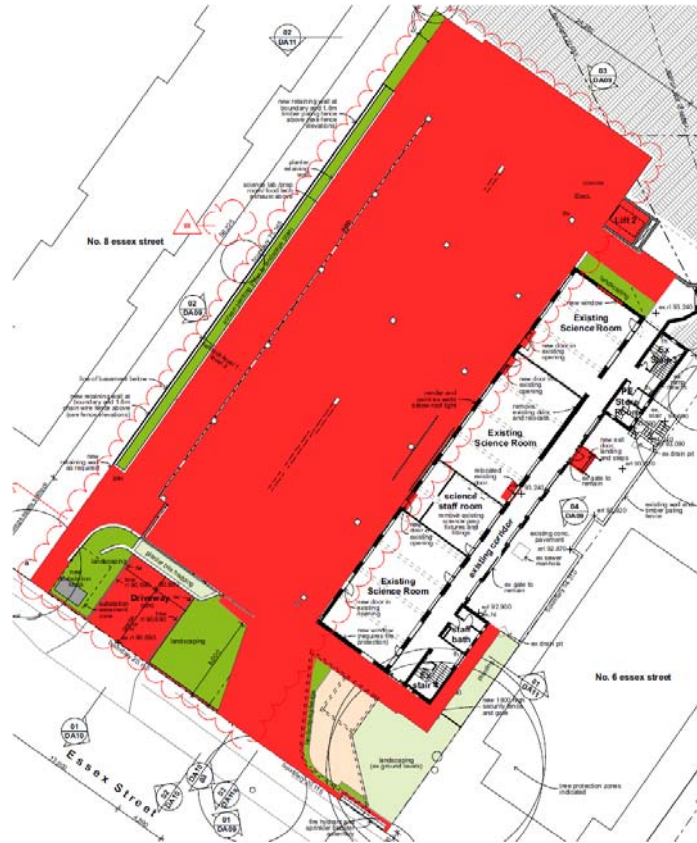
Proposed Level 1 plan under DA/89/2017/C.
